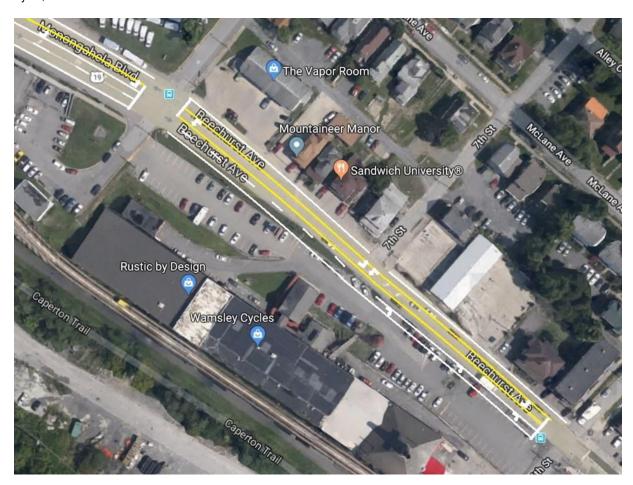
Widen to 4 Lanes Between 6th Street and 8th Street
